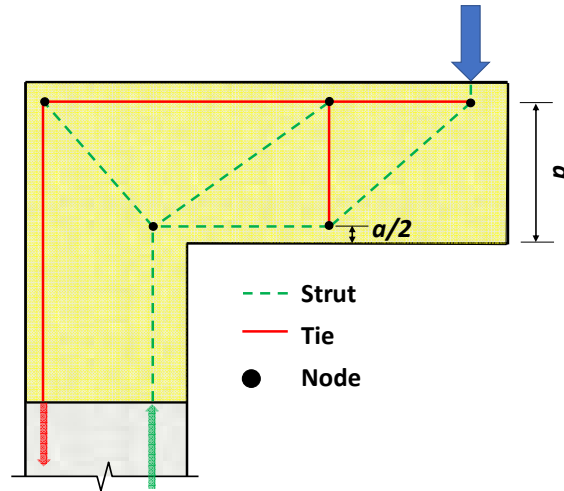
Example strut-and-tie model of cantilever beam and joint
